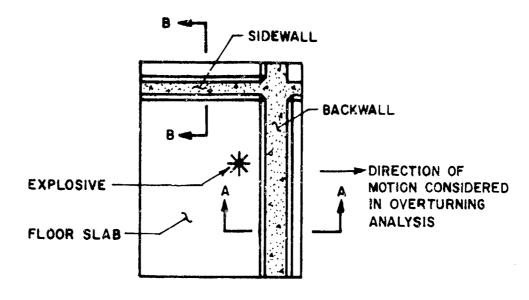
Cantilever wall barrier - Estimated foundation dimensions.
